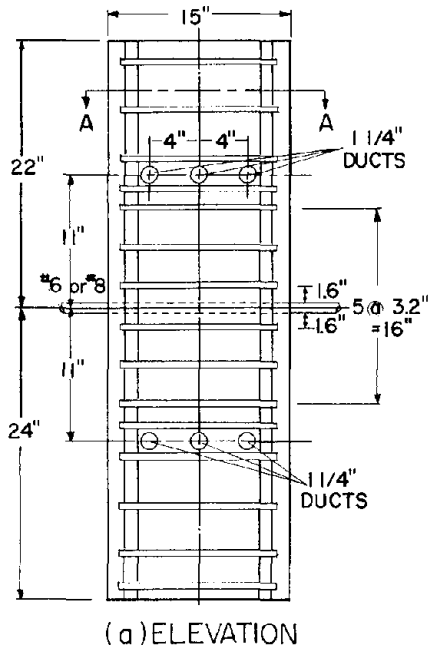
Reinforcing Cage for 15 in. Specimen
